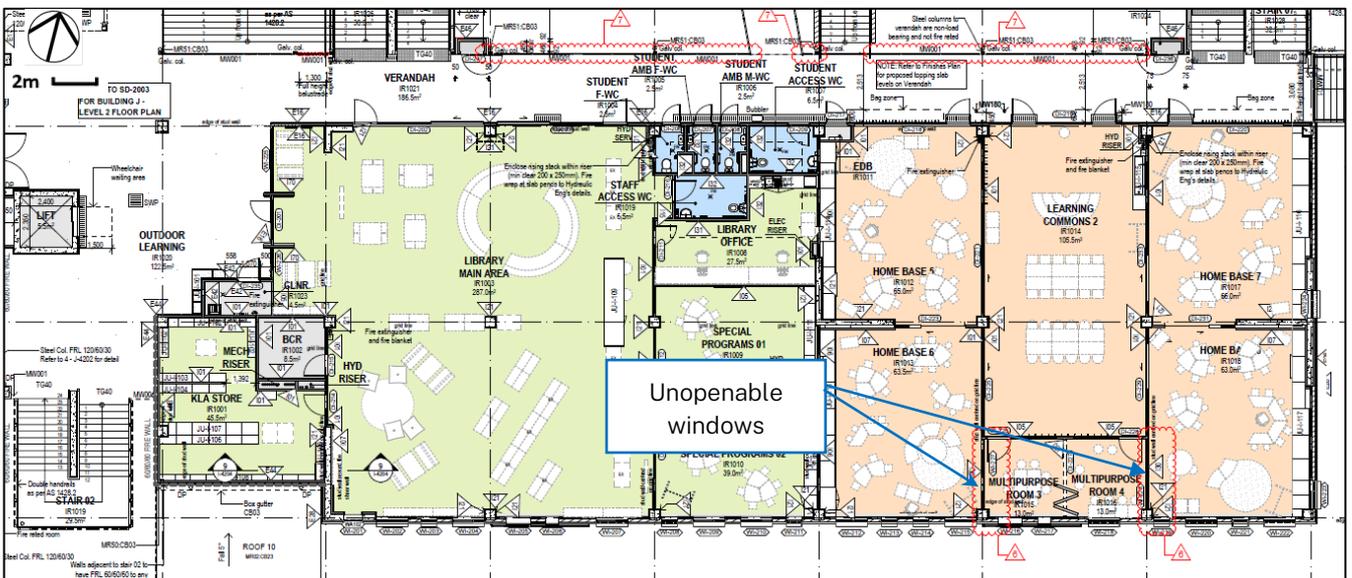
| Proposed level 2 floor plan of Building I (Source: Modification 3, 2023)
